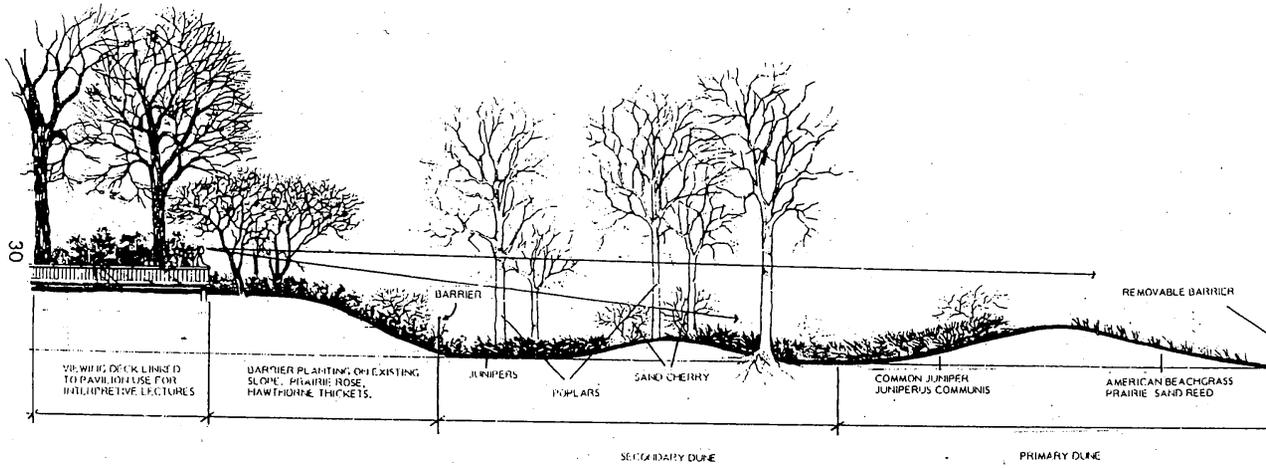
Lighthouse Landing, Dune Reconstruction Section
